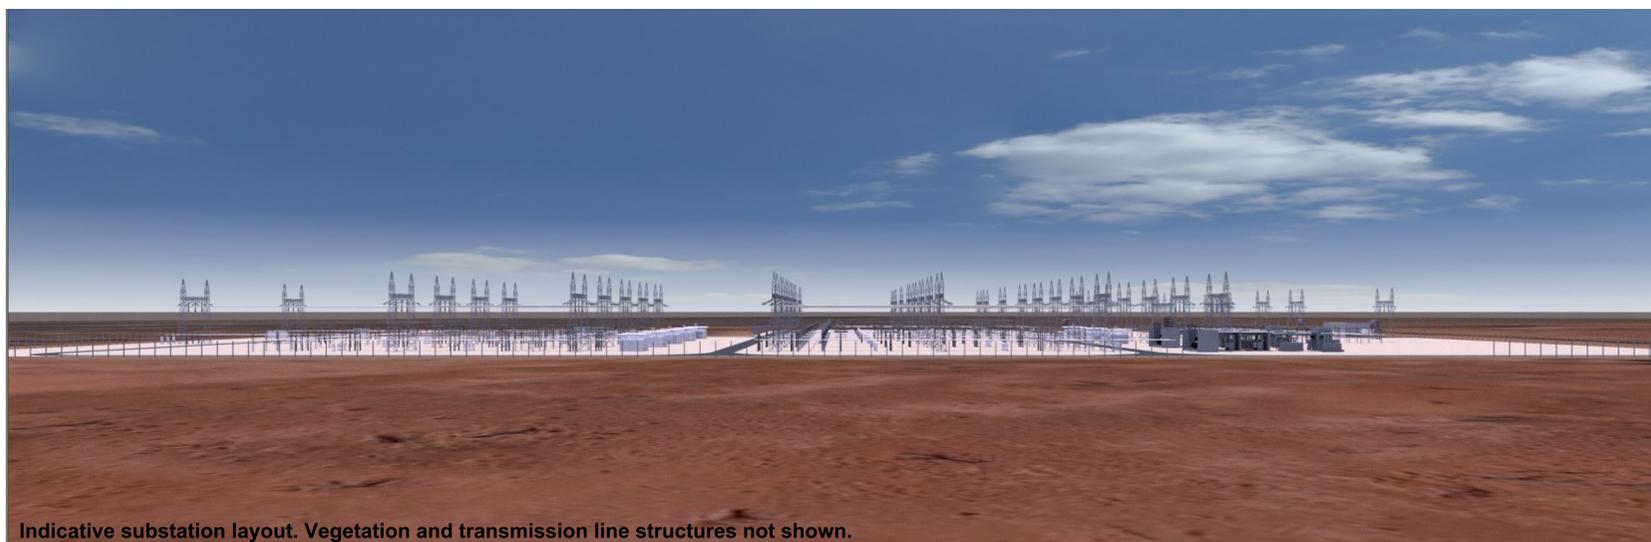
Arrangement of the proposed substation layout (indicative)
